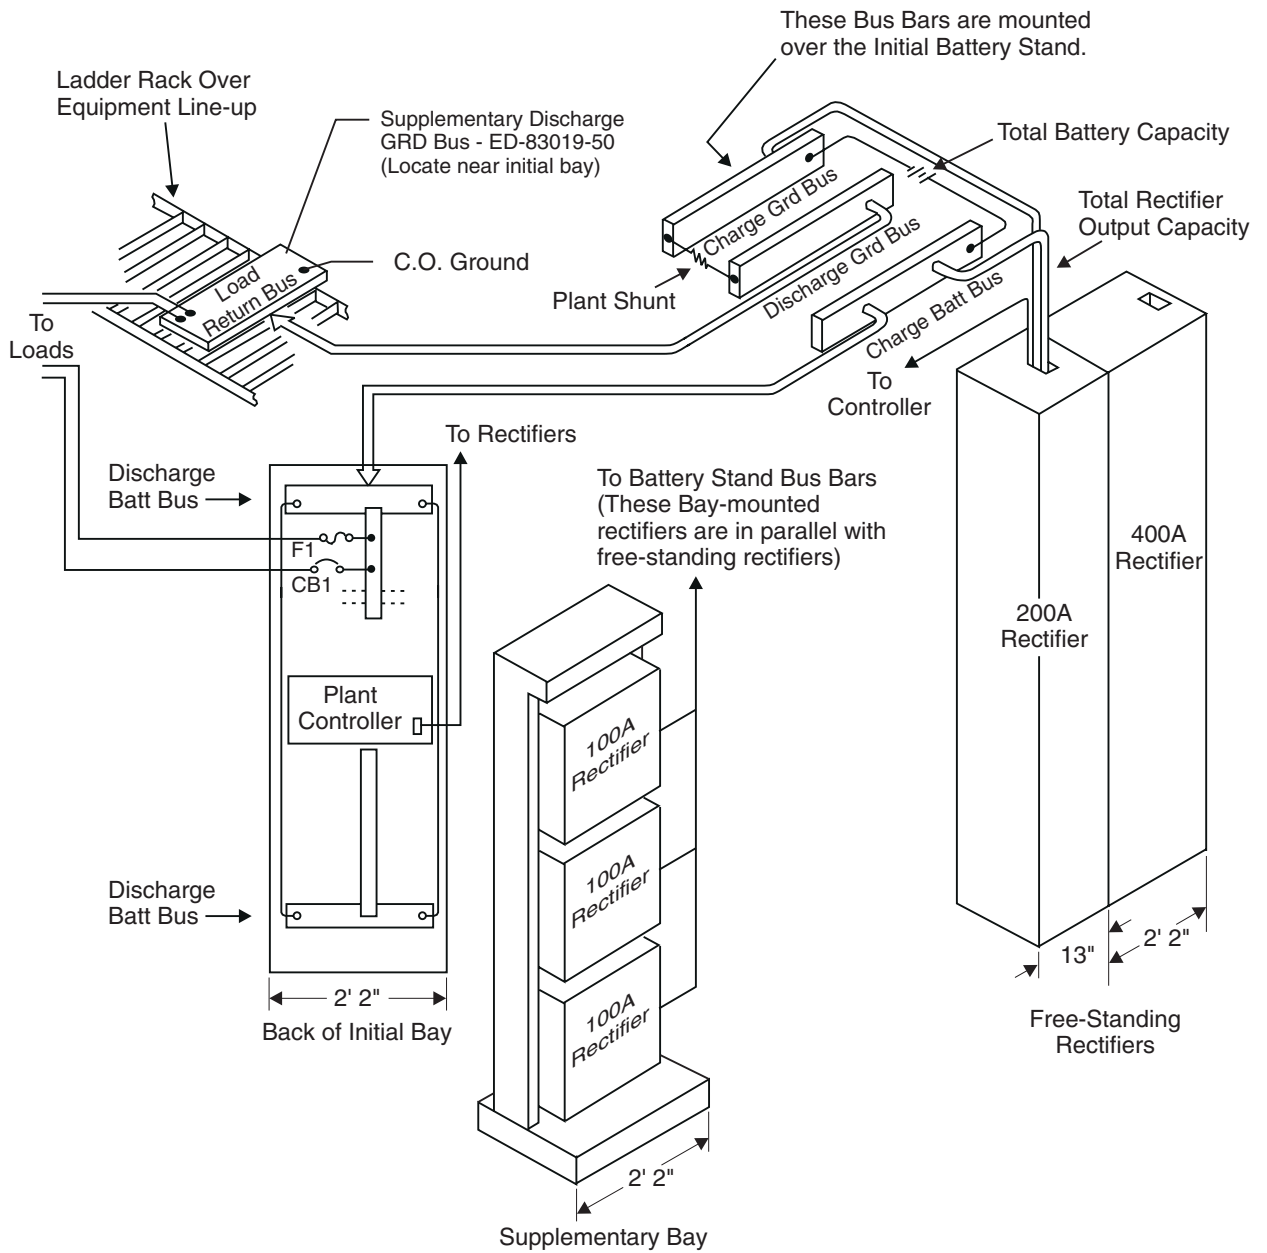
Typical J85500A-2 cabled battery plant schematic
